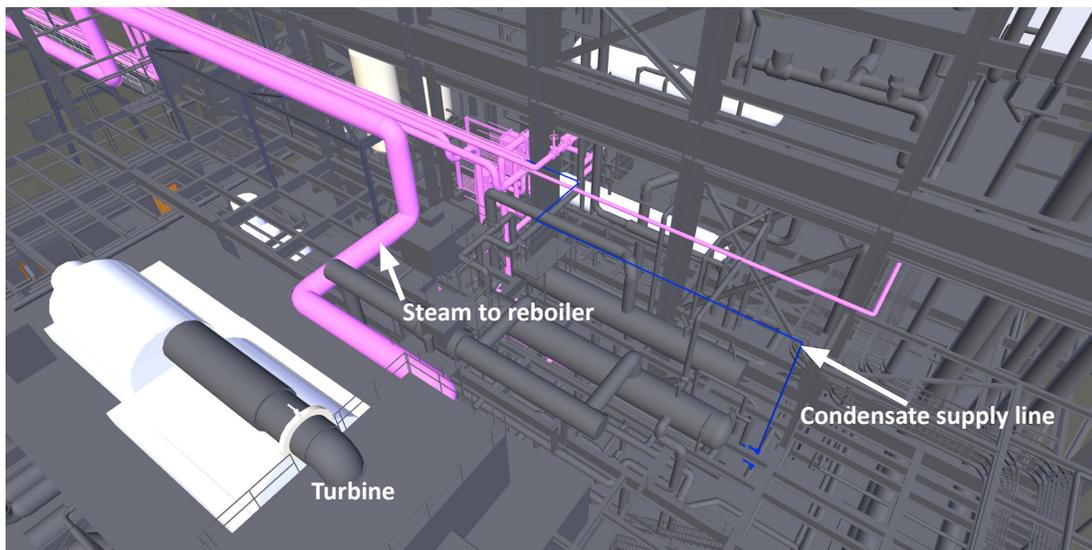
Proposed design and location of condensate supply line (highlighted in blue with the north wall of the powerhouse and the operating floor hidden)
